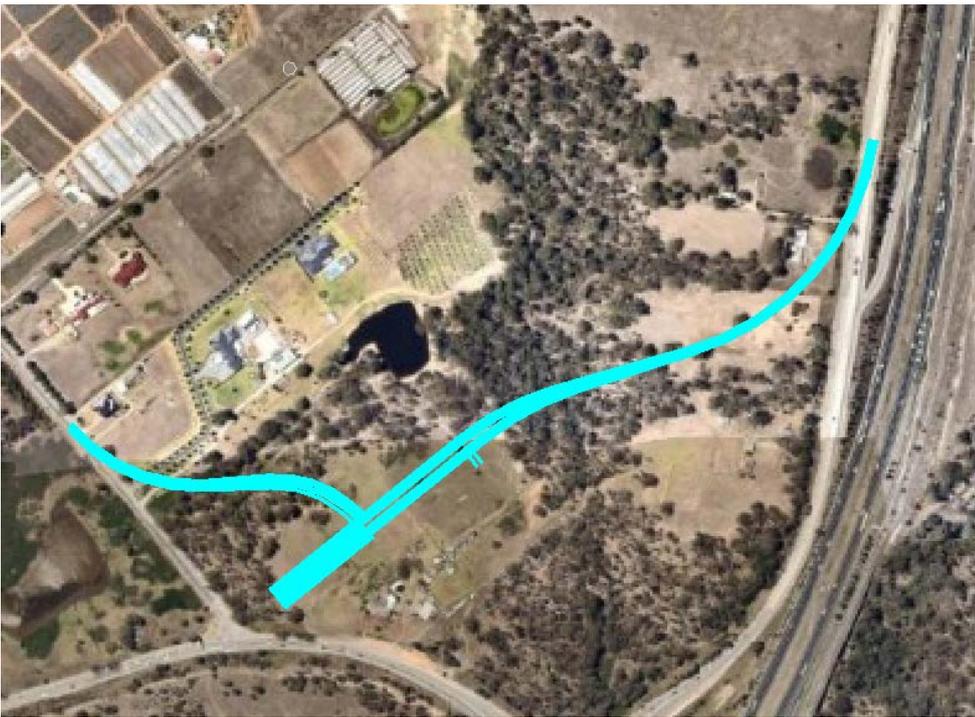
Refined Option 1 of Strategic Wallgrove Road/Cecil Road realignment options
